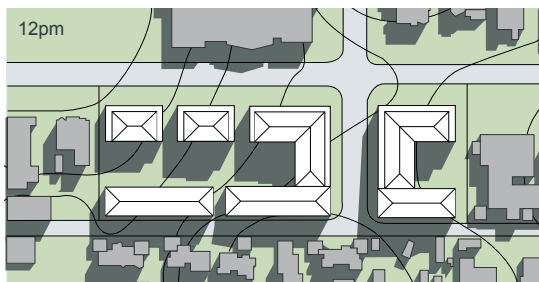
B.2 Building orientation and height influences solar access to apartments and common open spaces. On south facing slopes, orient the rear wing of the building(s) east to west to maximise solar access, on north facing slopes, step building(s) with the slope.
